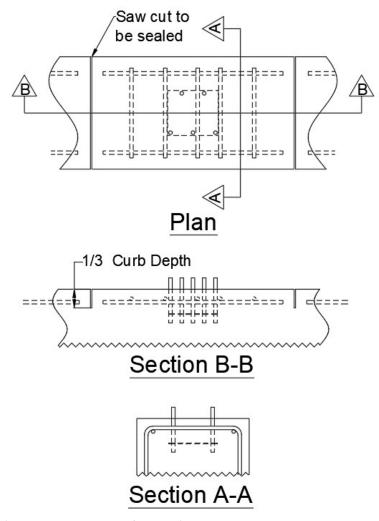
Example of potential rebar layout and saw cuts that may be used to reduce uncontrolled cracking.
